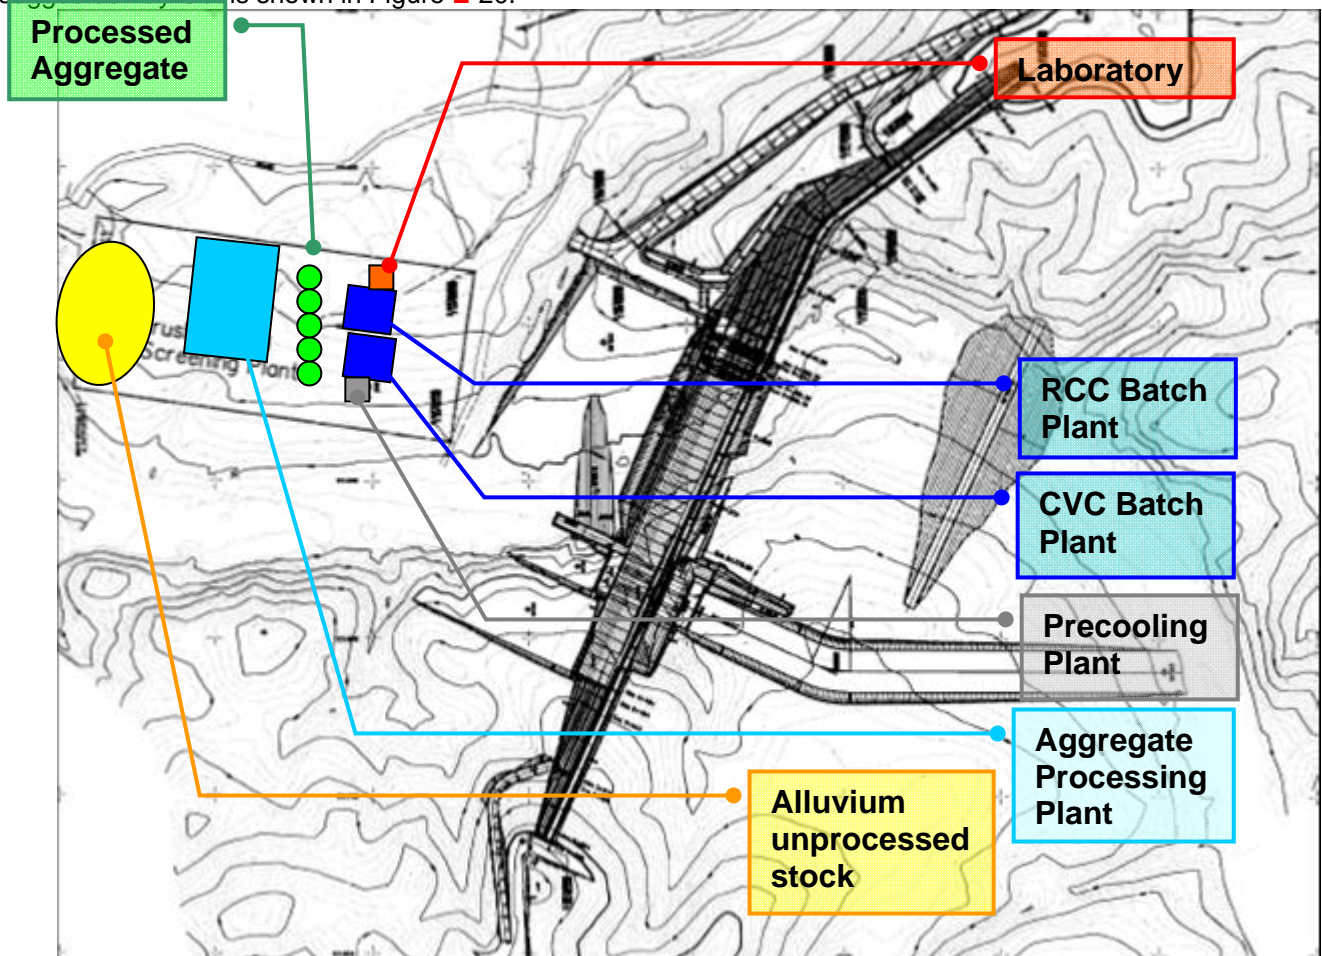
Lay Out that can be adjusted to the site's Topographic conditions for the concrete batch plants (CVC & RCC).
